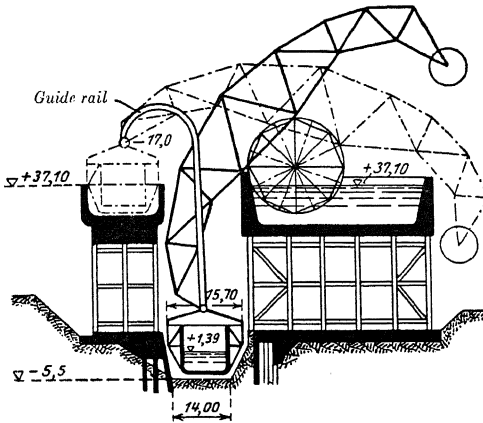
Counterpoise ship lift (by M.A.N.) arranged with cantilevers supported on floats
